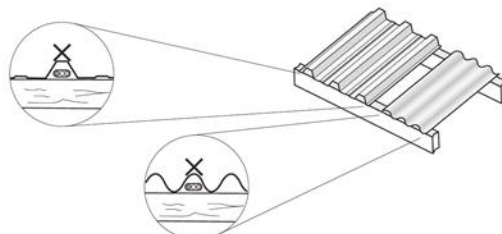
PROHIBITED WIRING SYSTEM LOCATION—
